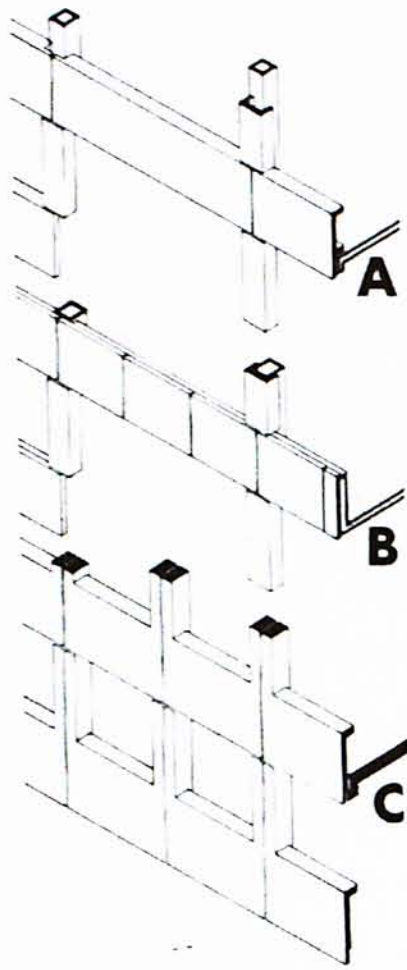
the three basic ways of using pre-cast concrete in architecture: (A) cladding fixing to a structural frame; (B) permanent formwork to in situ concrete structural members; and (C) loadbearing primary structural components
